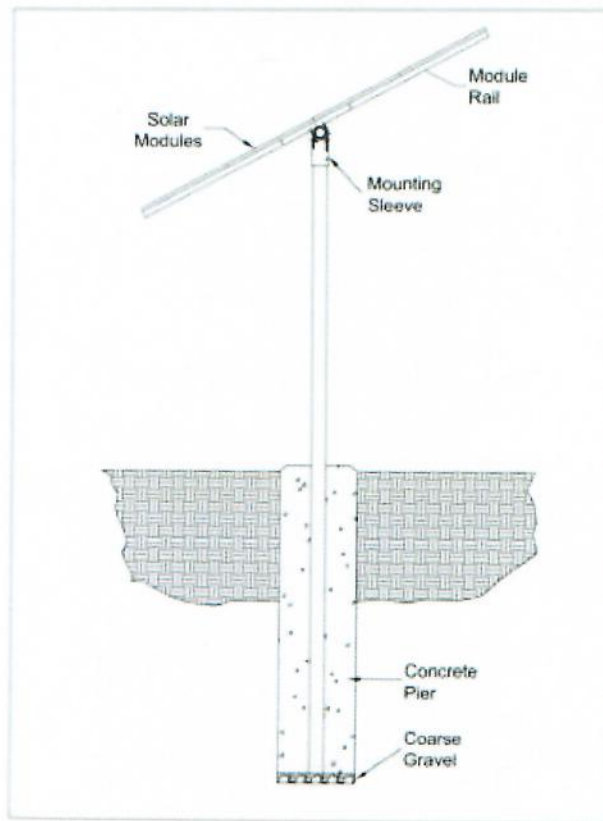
Schematic of Completed Concrete Pier Foundation and Solar Panel.
